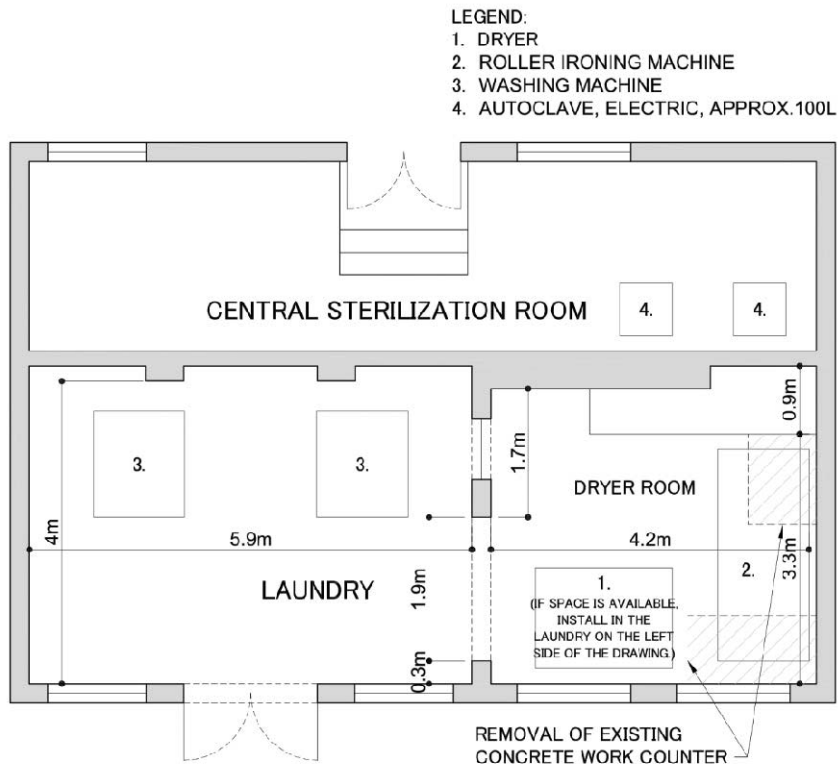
Equipment Layout in Central Sterilization Room and Laundry at Jinja RRH
